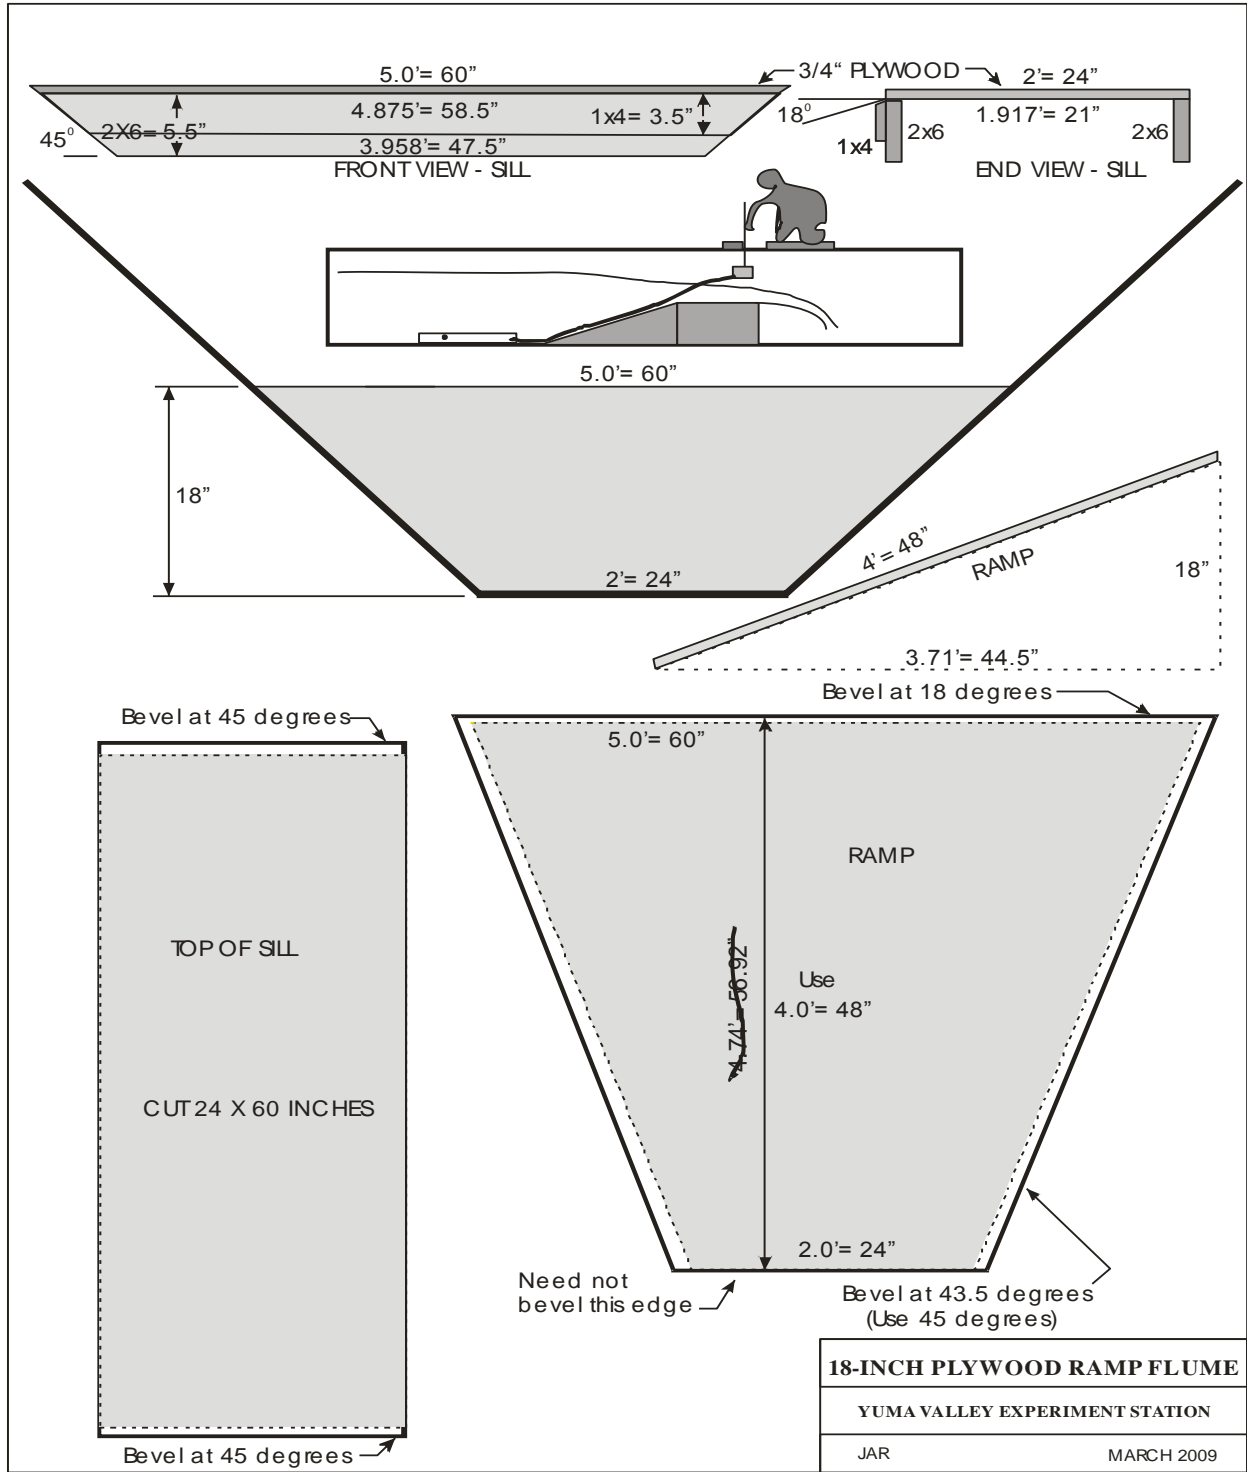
Flume construction drawings – 1.5ft (18in) sill height
